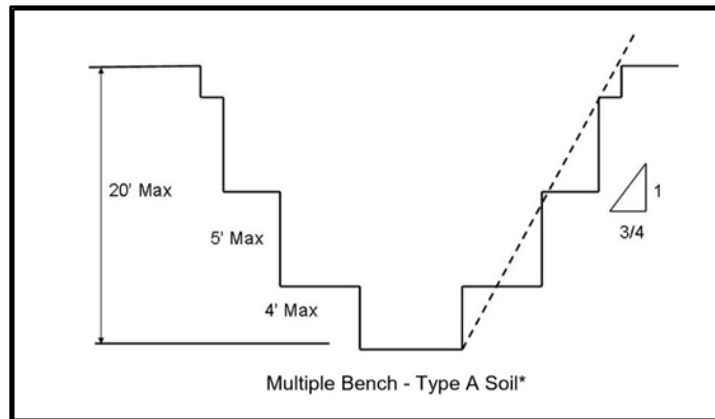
Tiered (Multiple) Benching, Type A Soil
